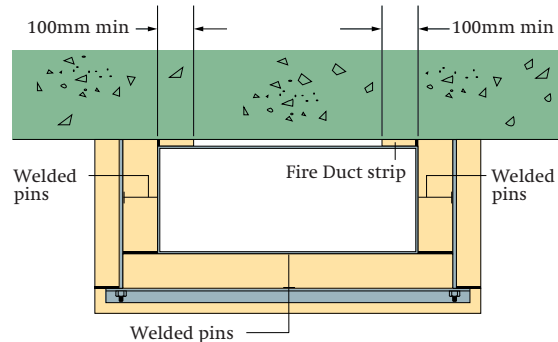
Three sided protection for rectangular ducts, using welded pin fixing method
